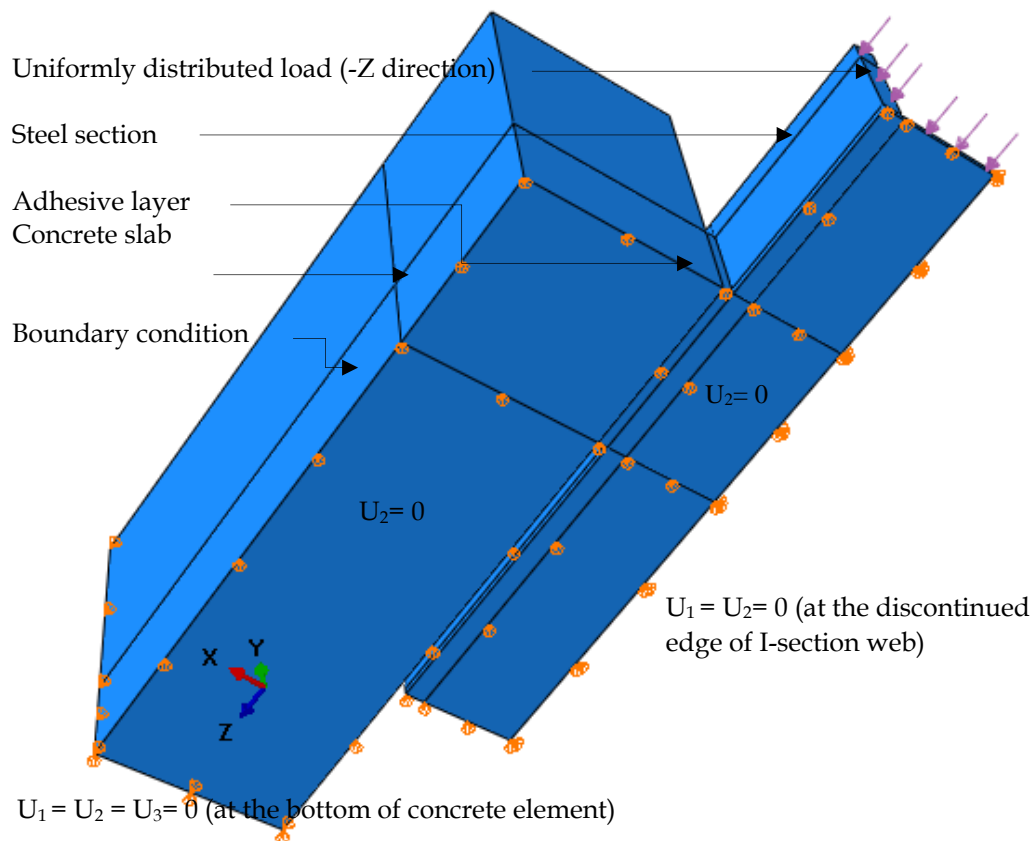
Geometric details of FE quarter model of steel-concrete composite push out specimen
